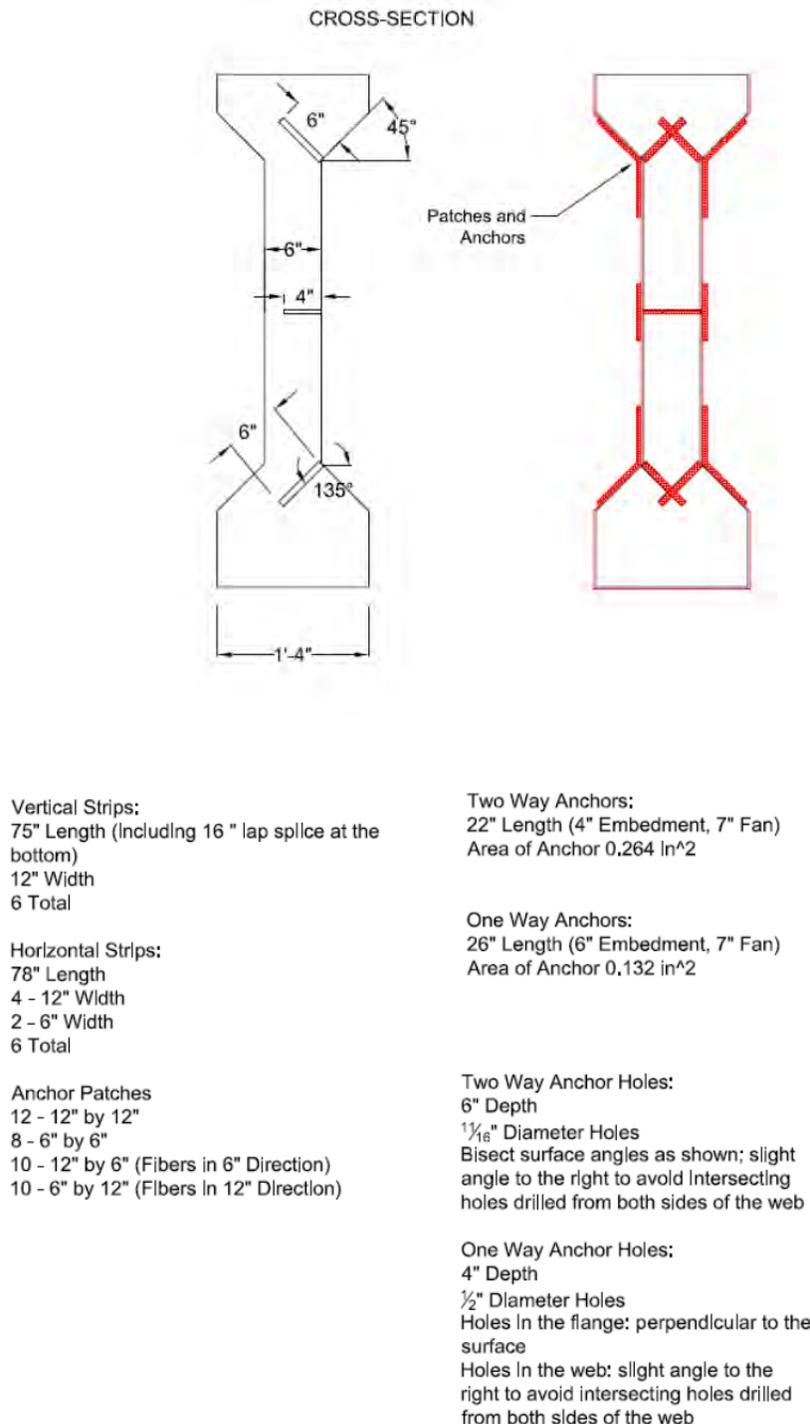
San Antonio I-Girder cross section and CFRP sheets and anchors
